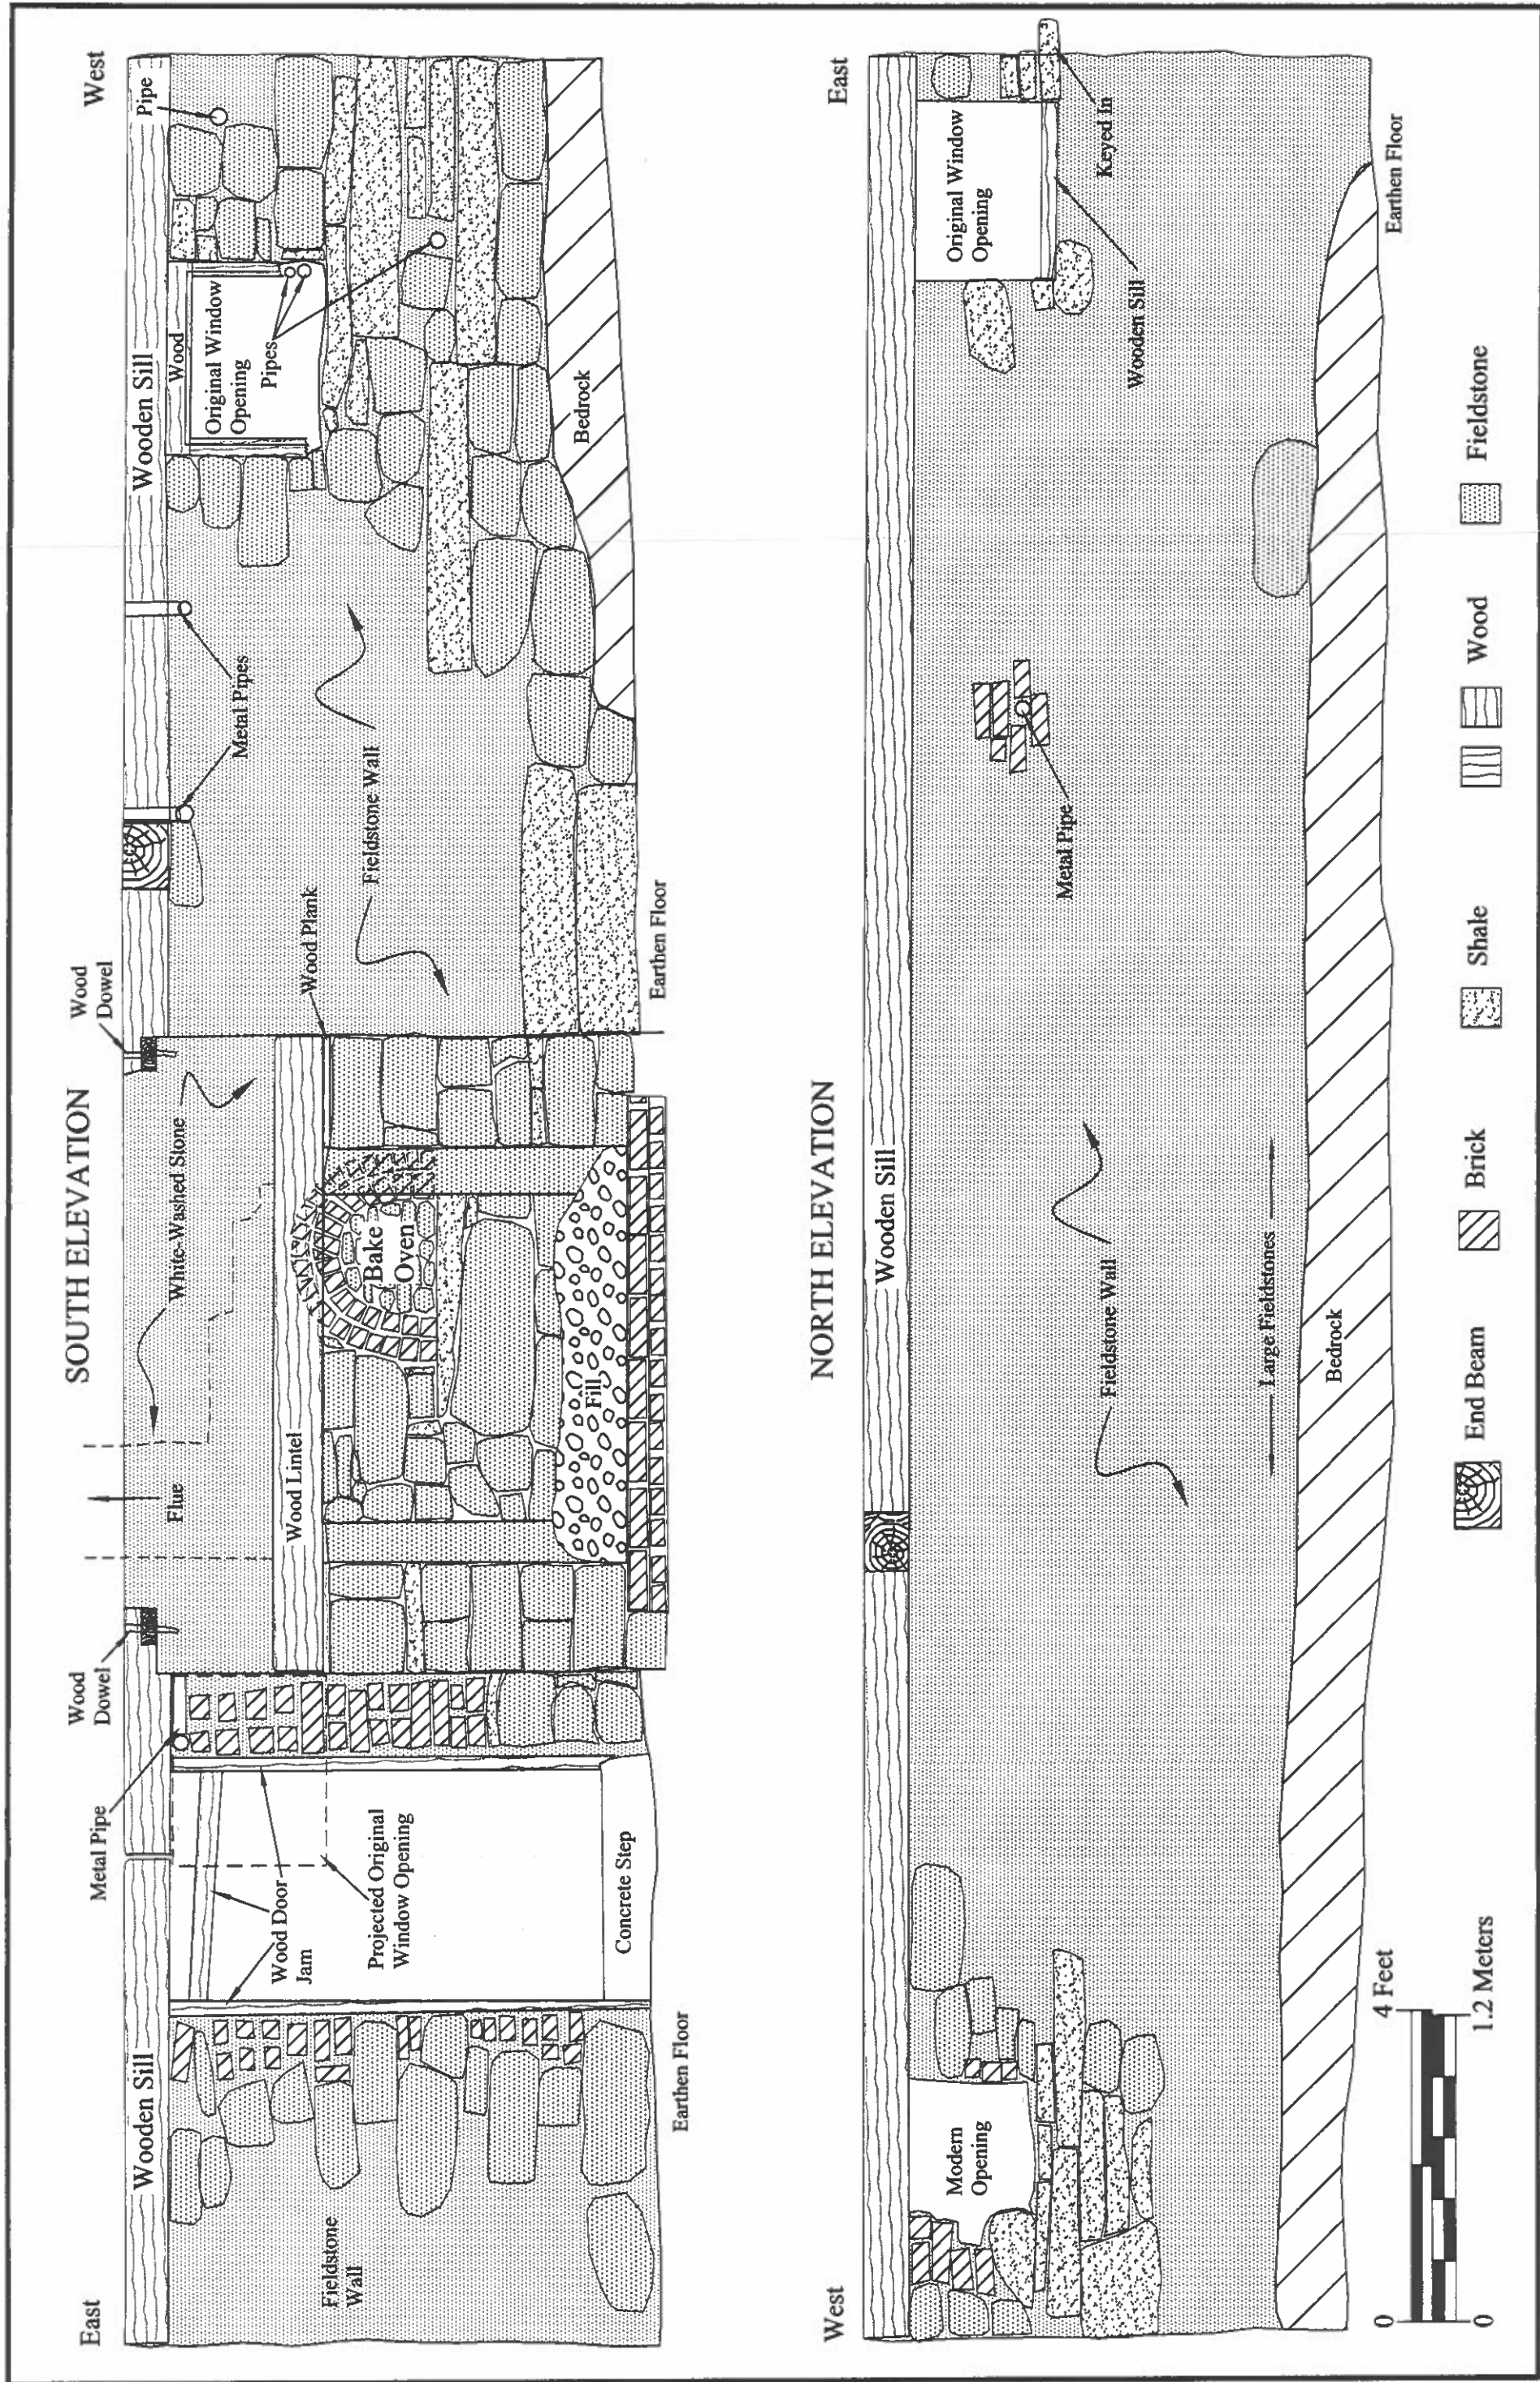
Wyckoff/Garrison House, Southern Section, Interior Elevations of Basement South and North Walls.
